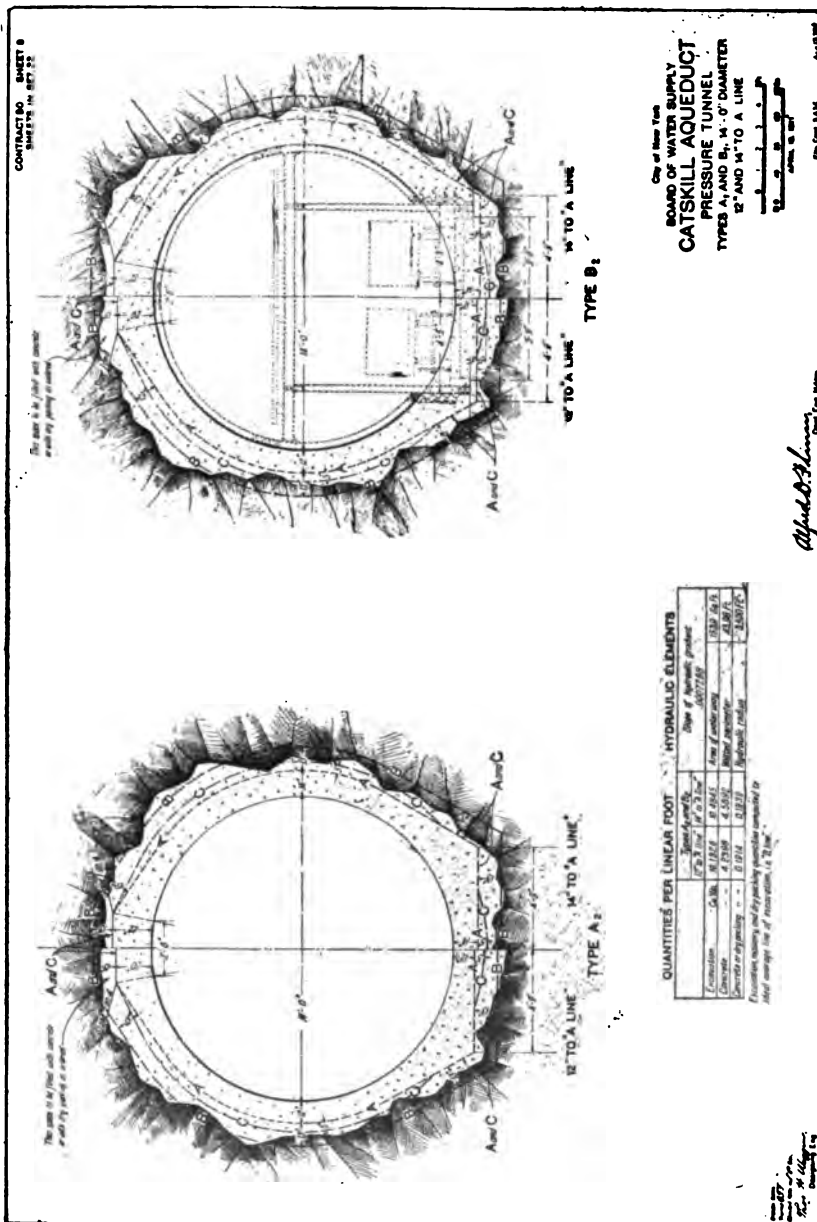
Contract 90. Typical Cross-sections of Hudson Pressure Tunnel. Different for others in use of flat bottom for excavation. The latest section used for pressure tunnels on Catskill aqueduct.
